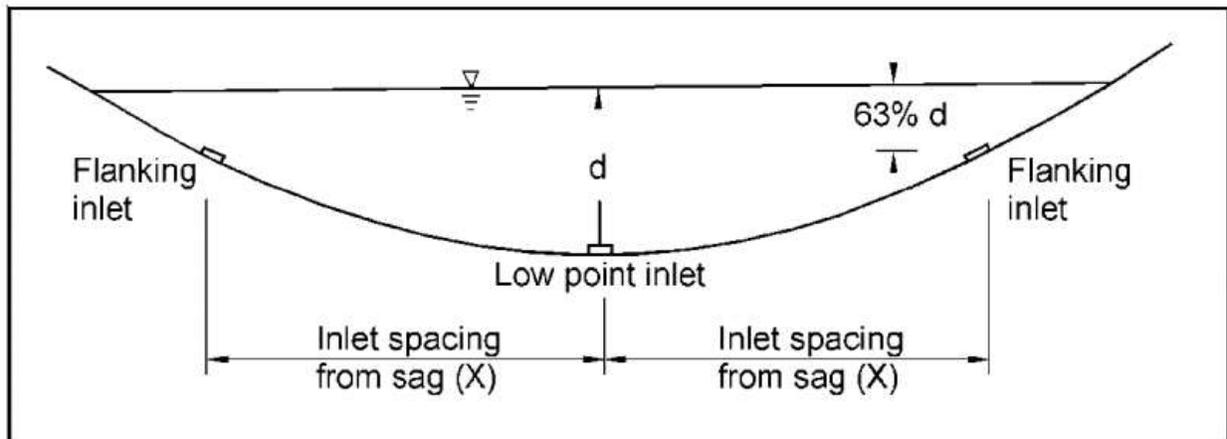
EXAMPLE OF FLANKING INLETS²⁵
